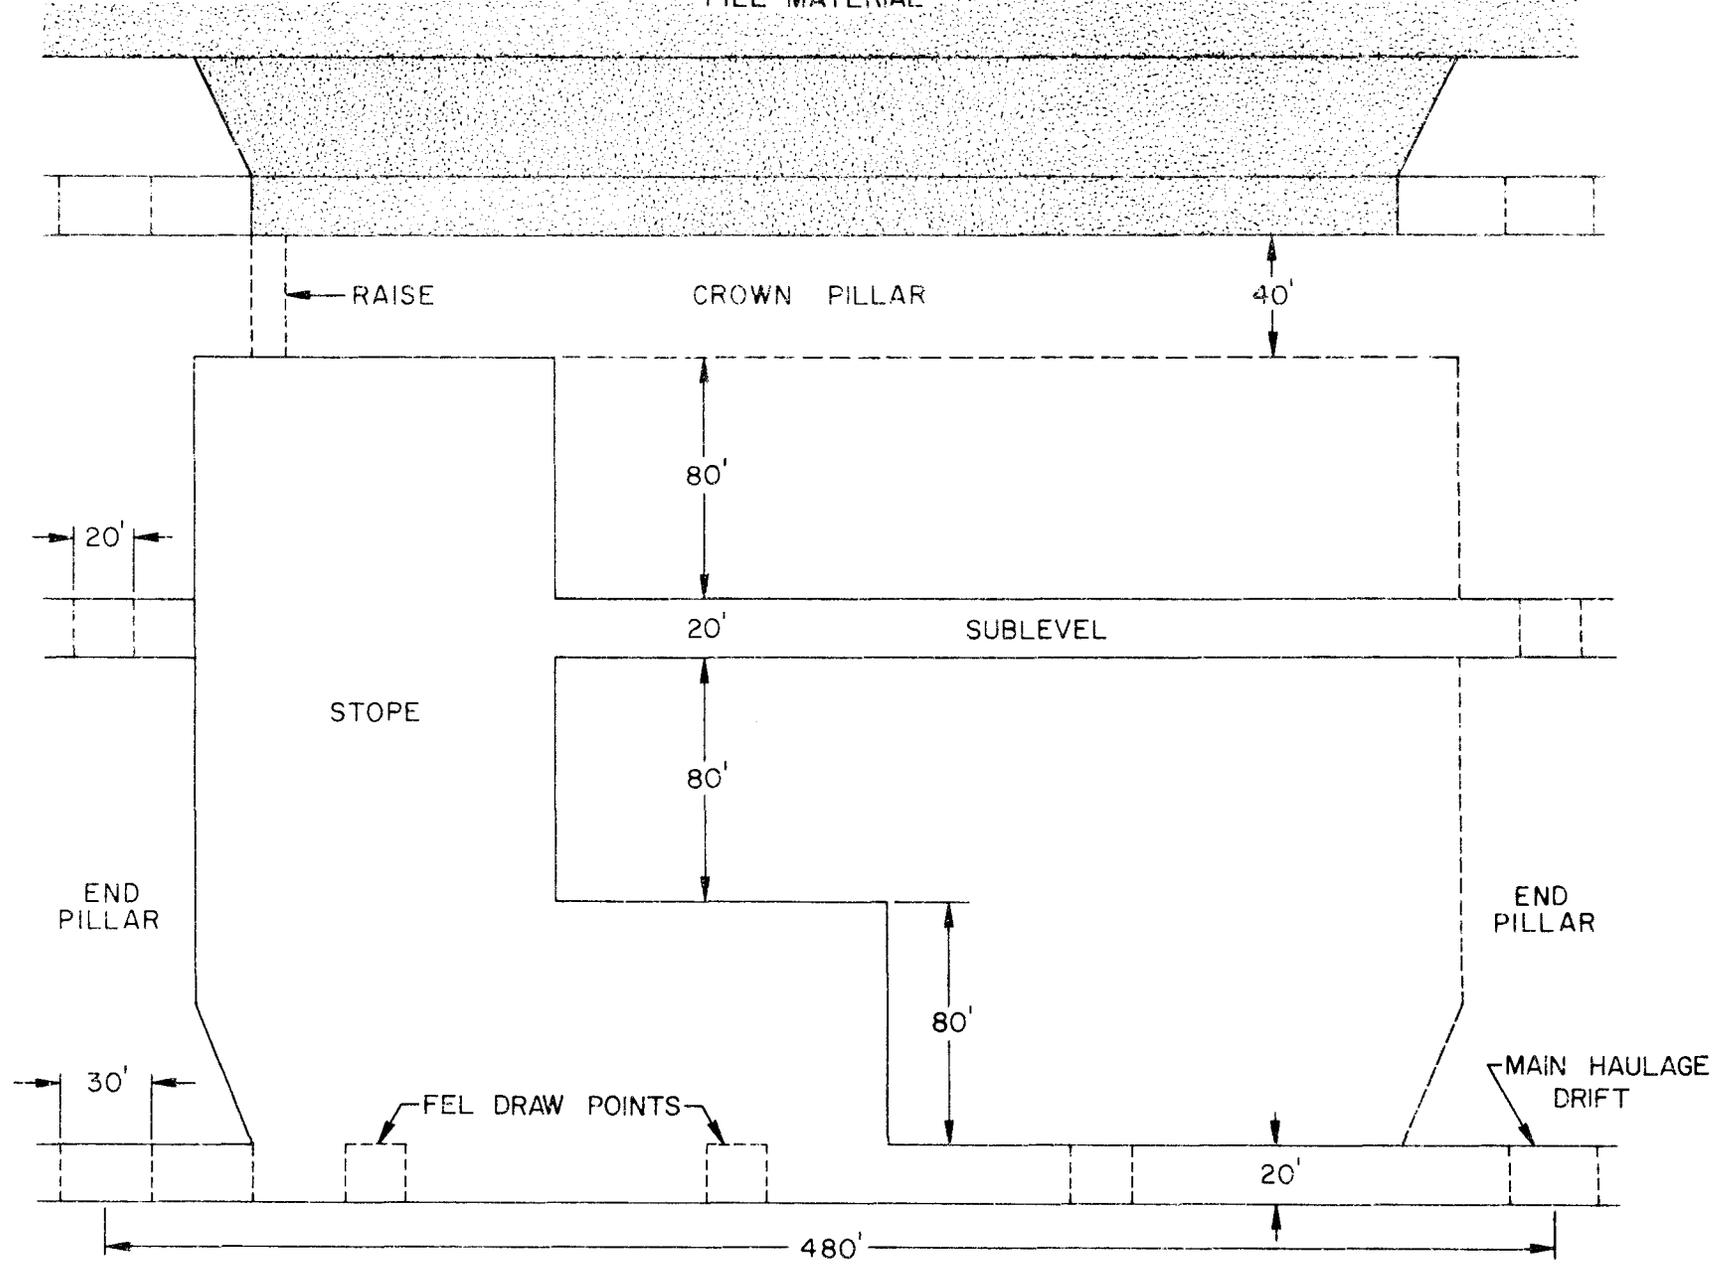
Longitudinal Section Through A-A', Sublevel Stoping with Spent Shale Backfill
